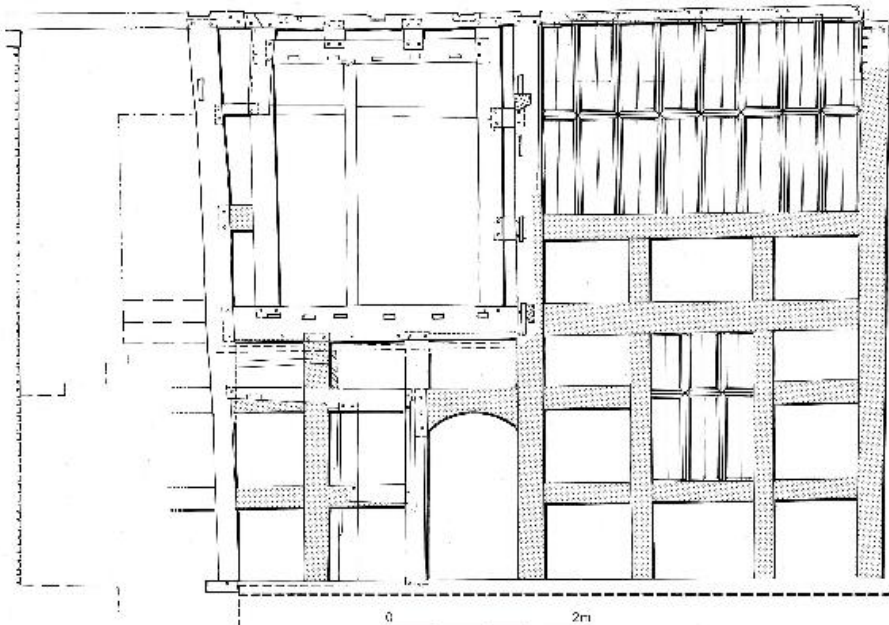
Survey and reconstruction (missing timbers shaded) of the eastern half of the rear, or south, frame of 50a St Owen Street, indicating a once high-status dwelling. The wall-plate provides evidence for the eight-light first-floor window and the opening in the framing to its left was probably for a stair turret
